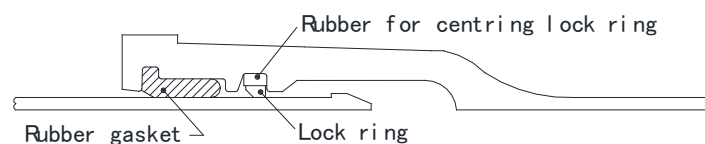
Joint structure of Type NS pipe joint (DN75~450) (Source: JDPA)
